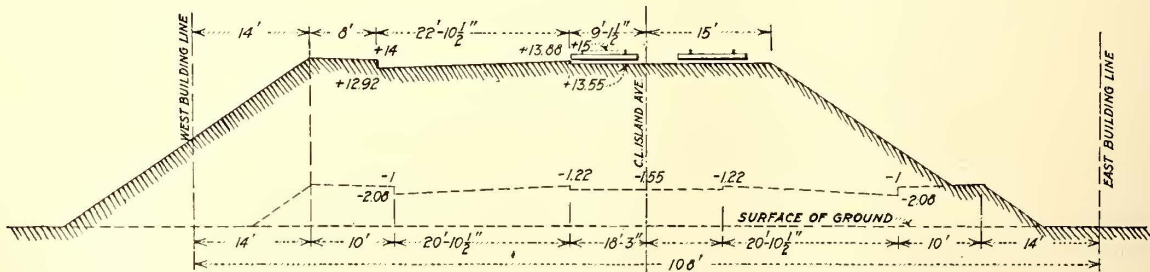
TYPICAL CROSS-SECTIONS OF THE NEW TRACK EXTENSION
